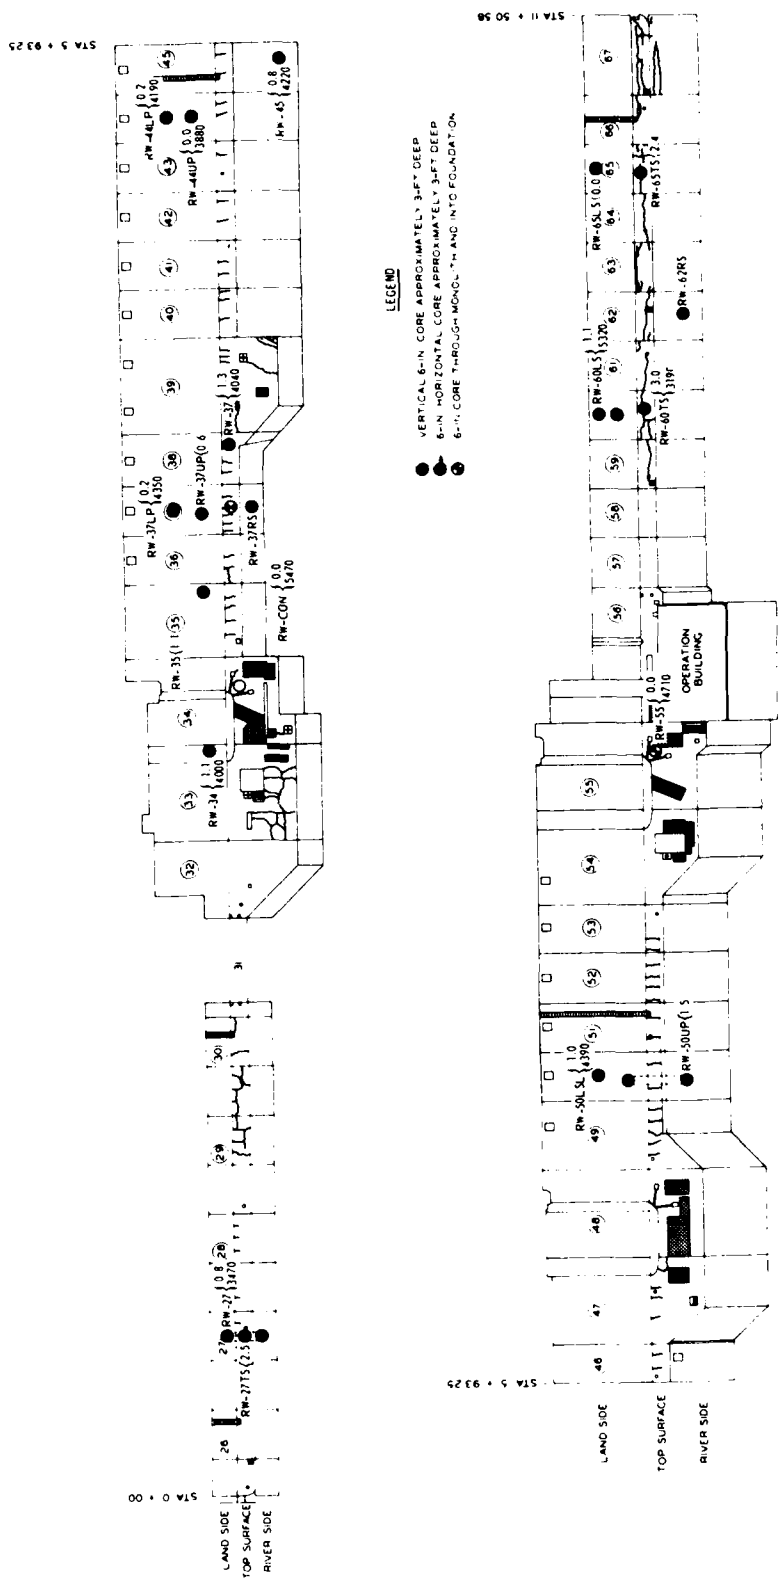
Core locations, depth of deteriorated concrete, and compressive strength below deteriorated concrete--river wall
